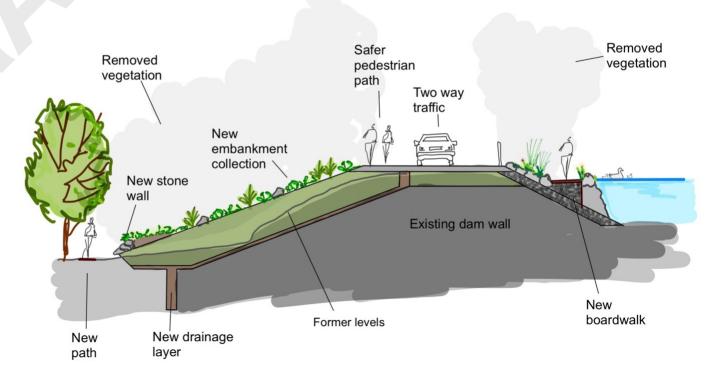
Preliminary section for the new Gong embankment, Cornish Street and boardwalk. Concept subject to Engineering approval.
